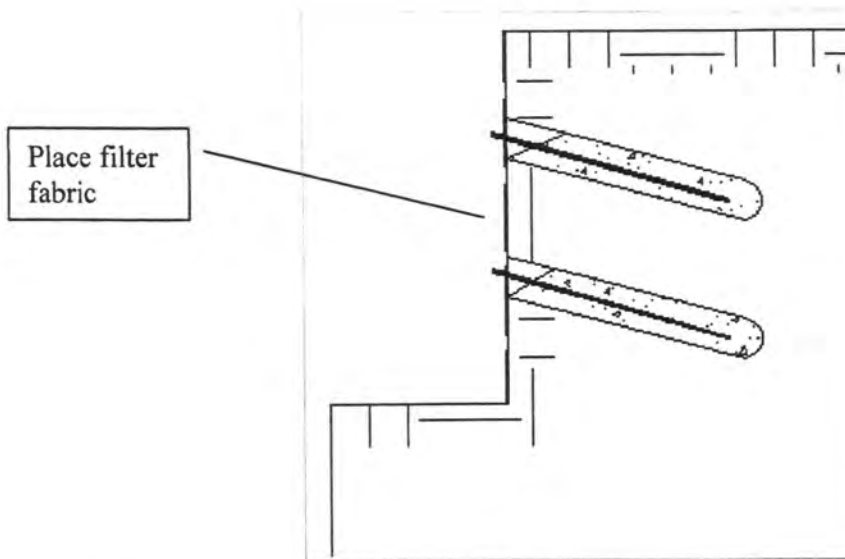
Picture showing step 5 of the construction process of Soil Nail wall
